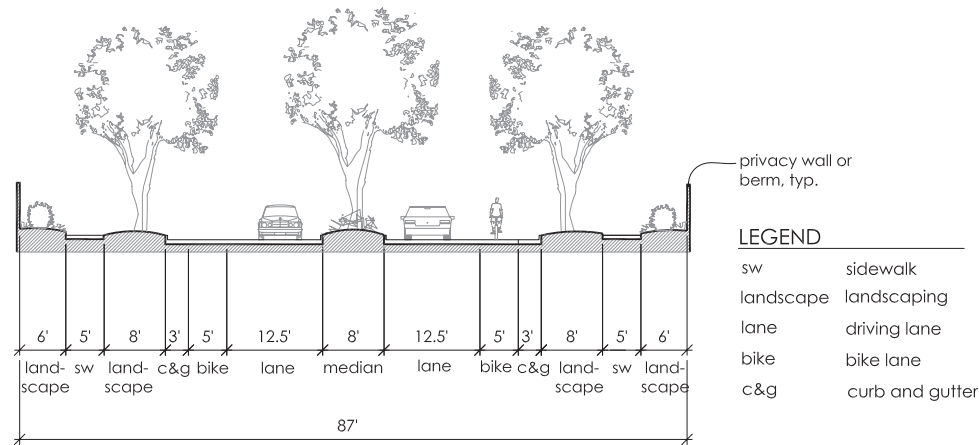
Neighborhood Residential Entry Plan and Elevation
